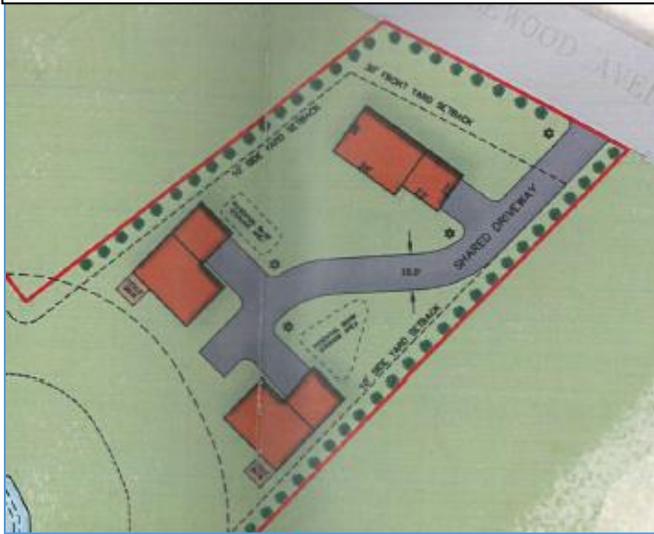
Site Plan submitted to Planning Board on September 19, 2016
